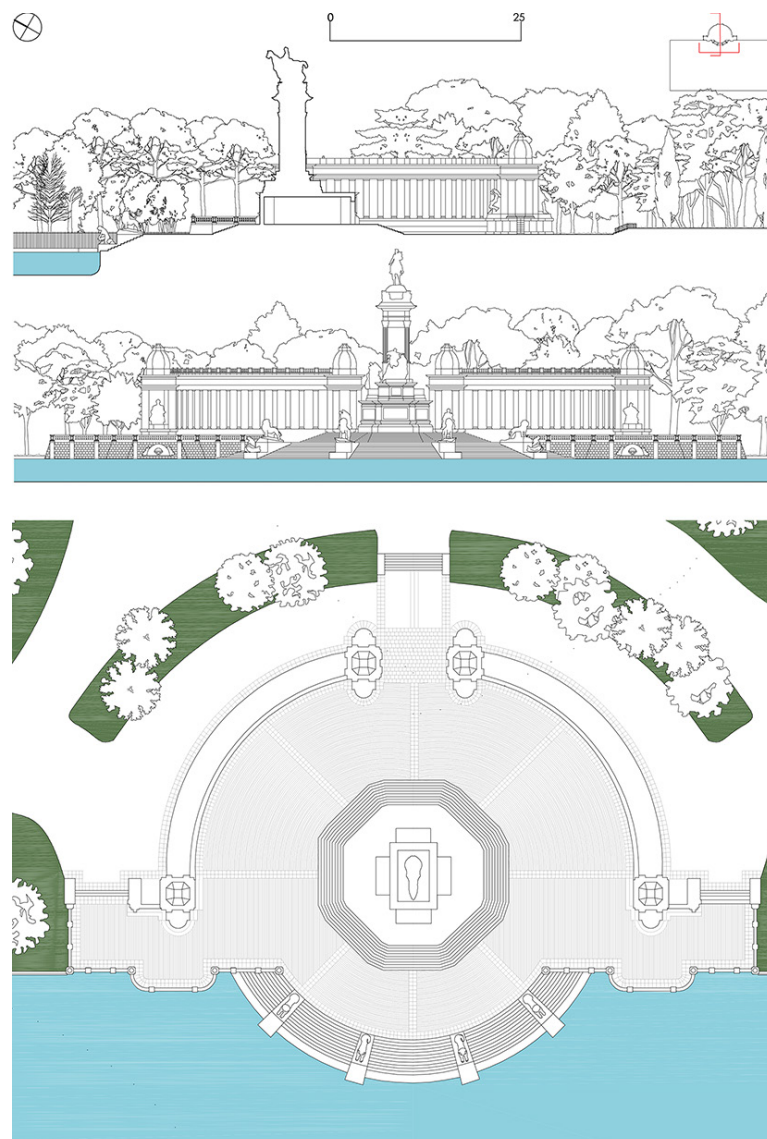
The Retiro Park in Madrid, *Estanque Grande*, roofs plan, section A-A' (top), section B-B' (bottom).
